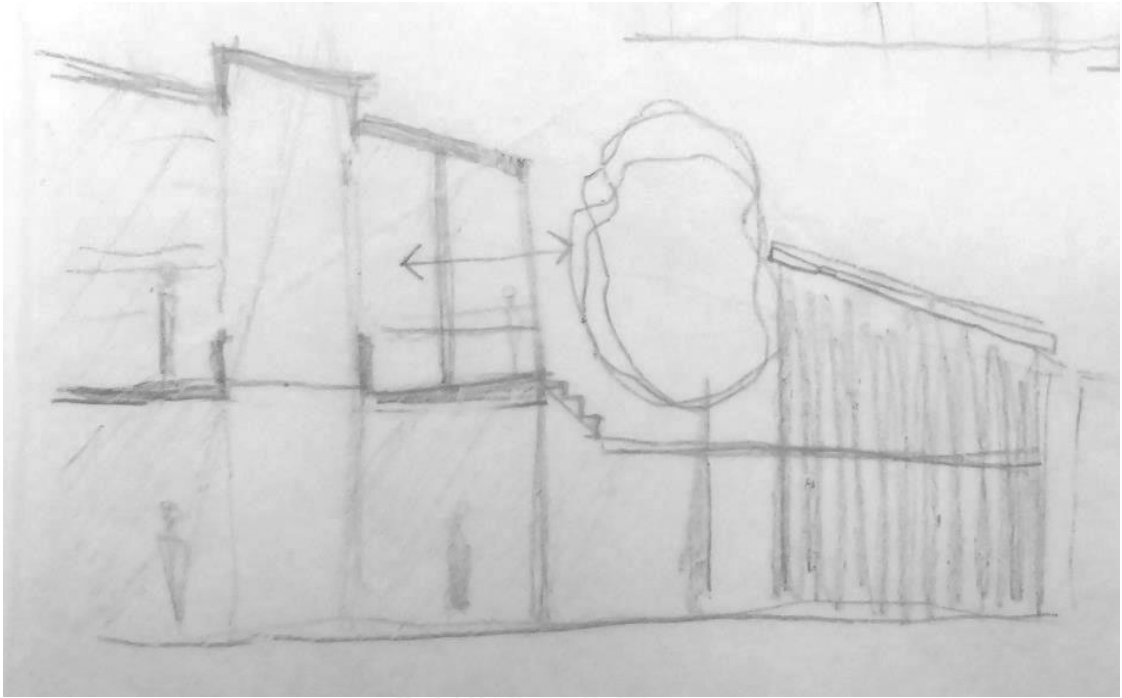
Section of the new Tourist Center. Sketch by author.
